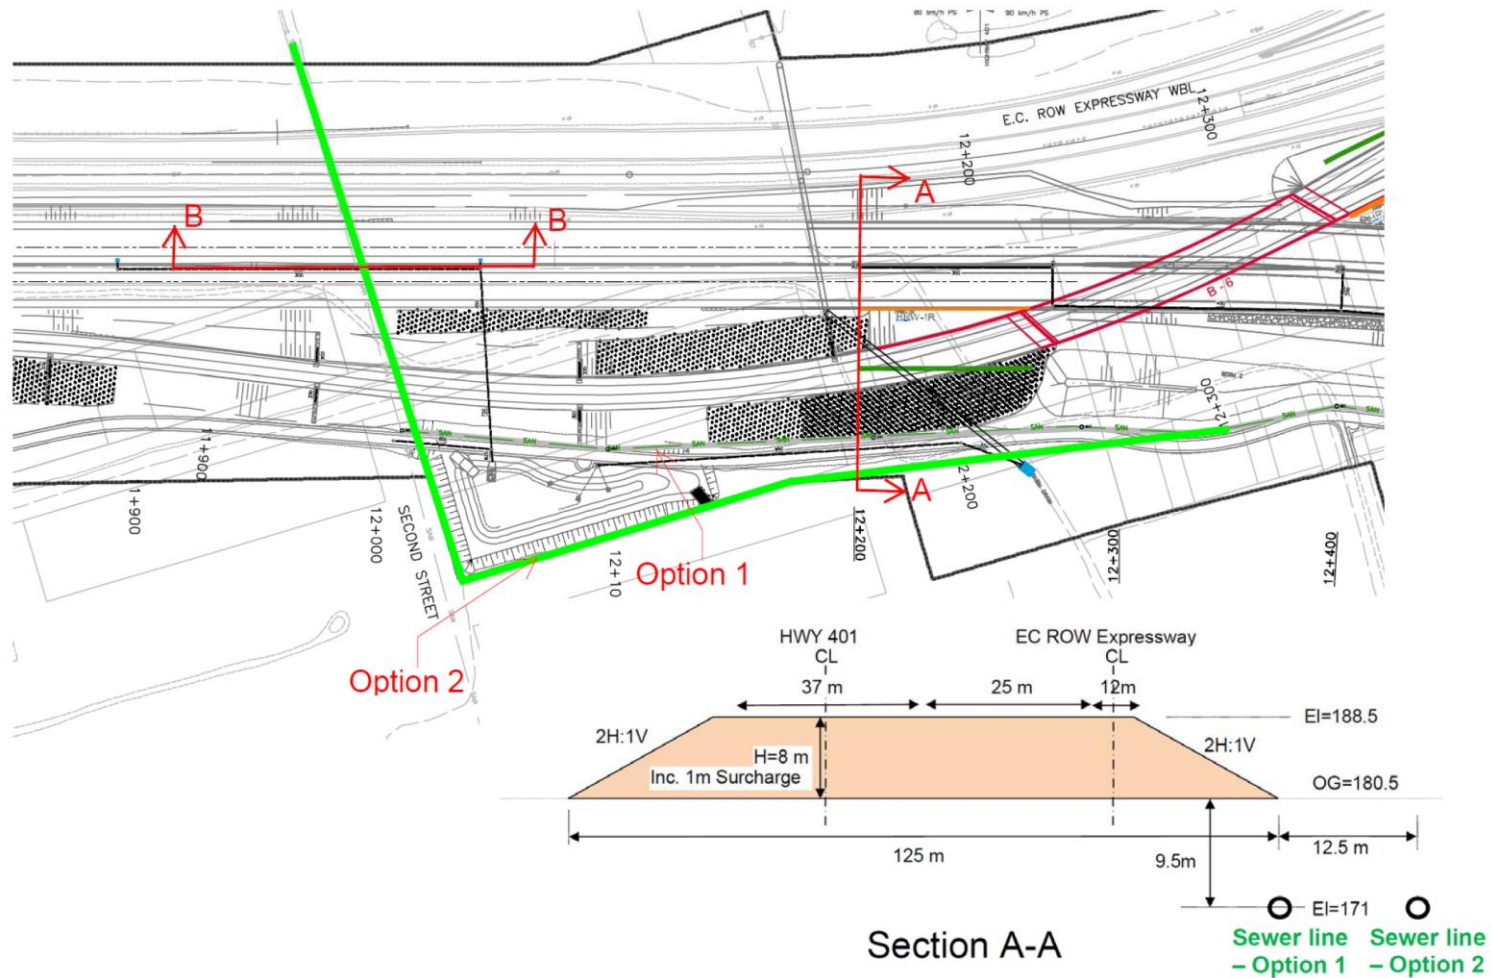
High Embankment Configuration and Sewer Line Segment at Second Street
